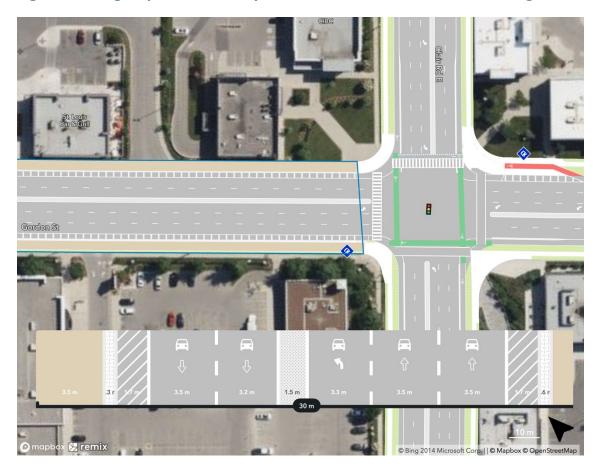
Design Option 2.2 Example between Clair Road and South Ring Road
